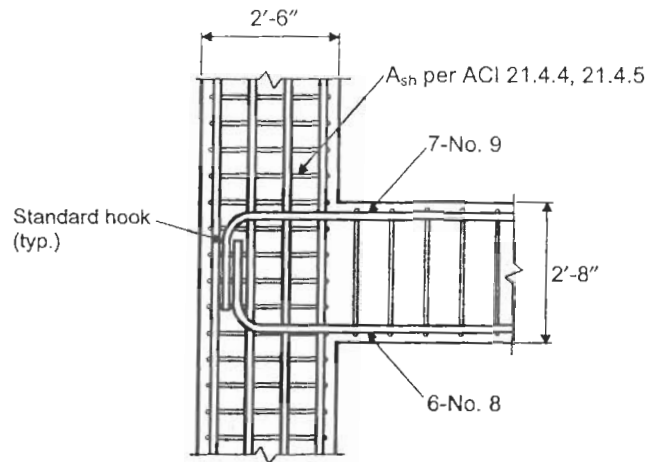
Reinforcement Details at Exterior Beam-Column Joint (SDC E)
